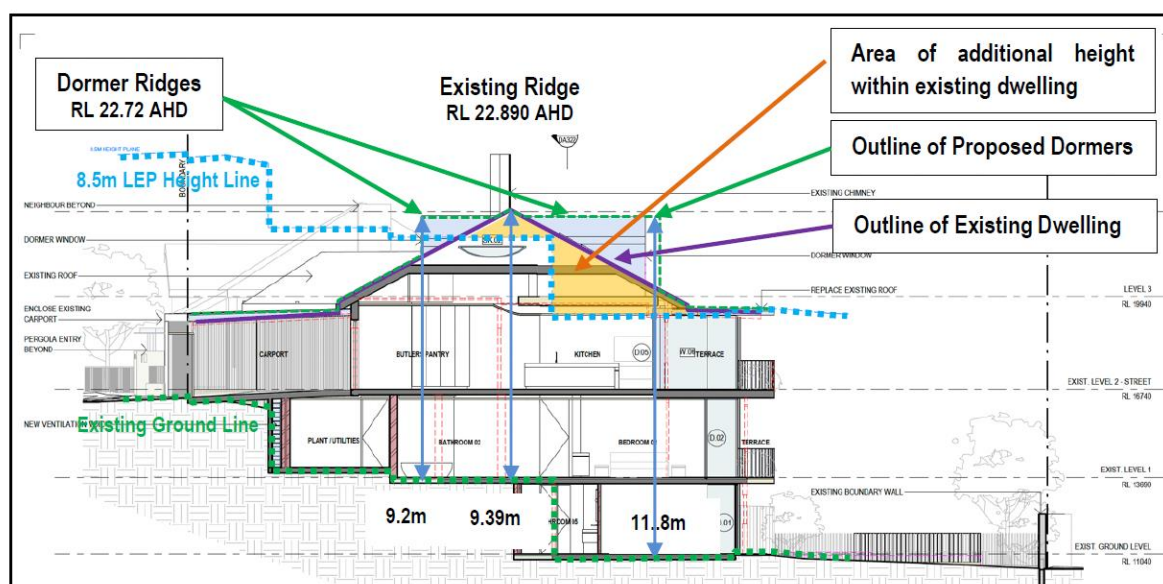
Extract of long section Diagram (source: GSA Planning, Clause 4.6 Exception to a Development Standard.
